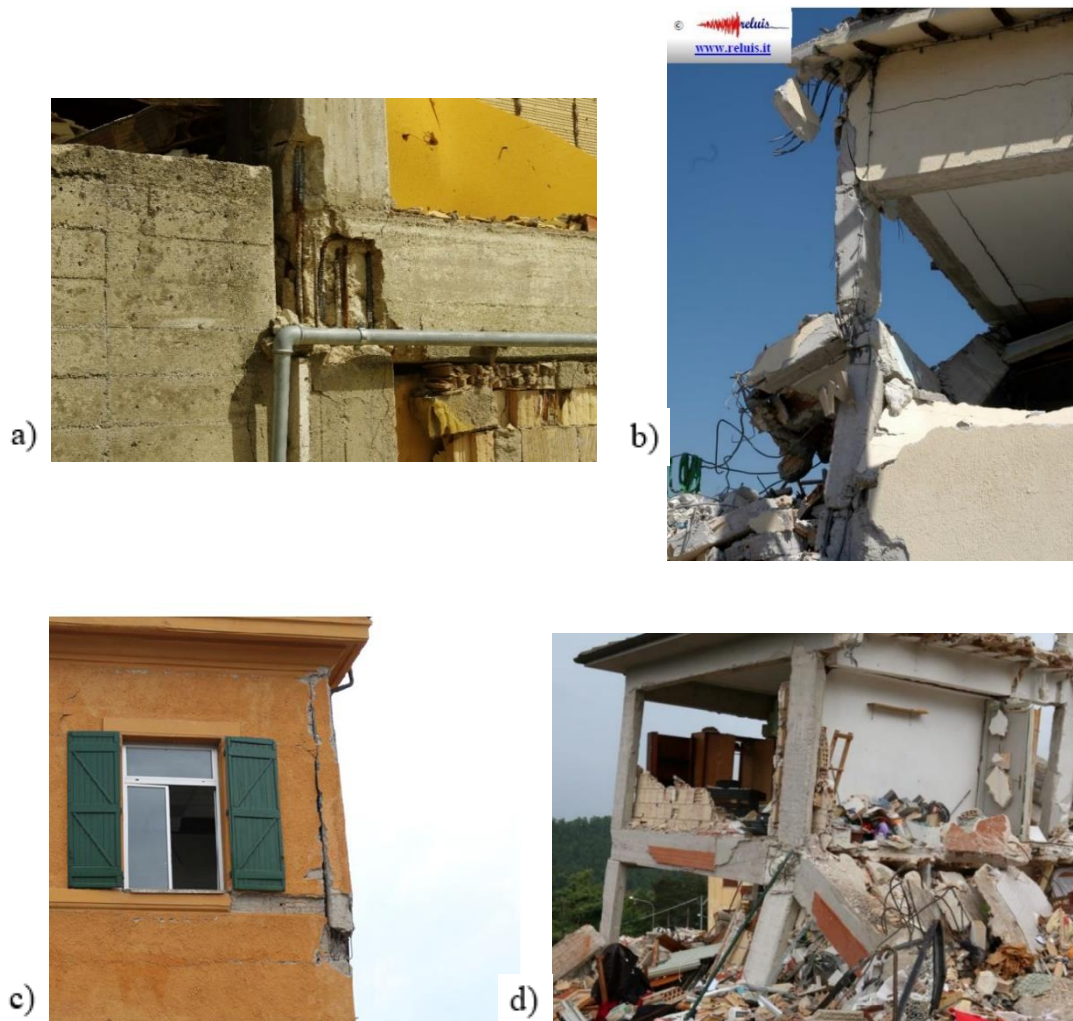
Inadequate joint behaviour in residential buildings. a) damage in the beam column joint with expulsion of the concrete cover due to lack of stirrups, Pescara del Tronto. b) damage in the joint connecting two columns and one beam - *ginocchio*, Hotel Roma, Amatrice. c) crisis in the joint between the column and the ring beam at the floor level, Amatrice. d) crisis in the joint due to lack of stirrups, Amatrice
